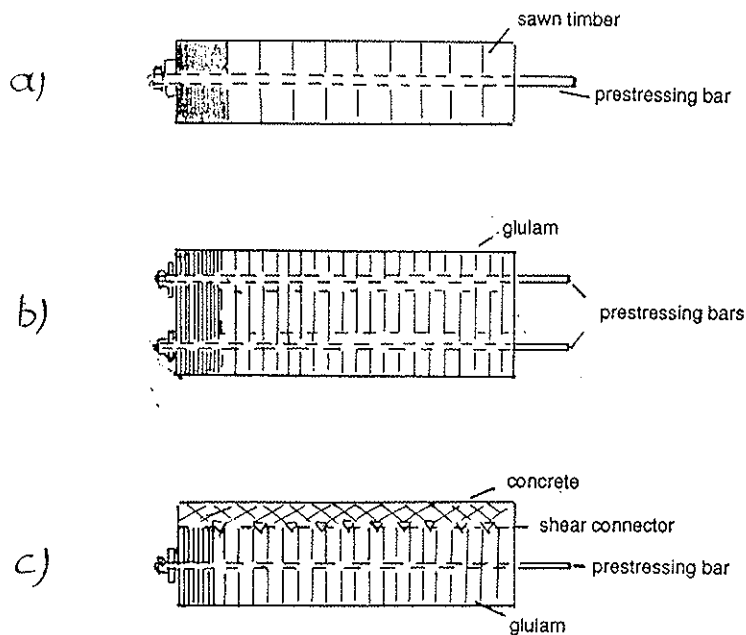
Typical examples of stress laminated decks: a) stress-laminated, b) glued and stress-laminated, c) stress-laminated and composite
